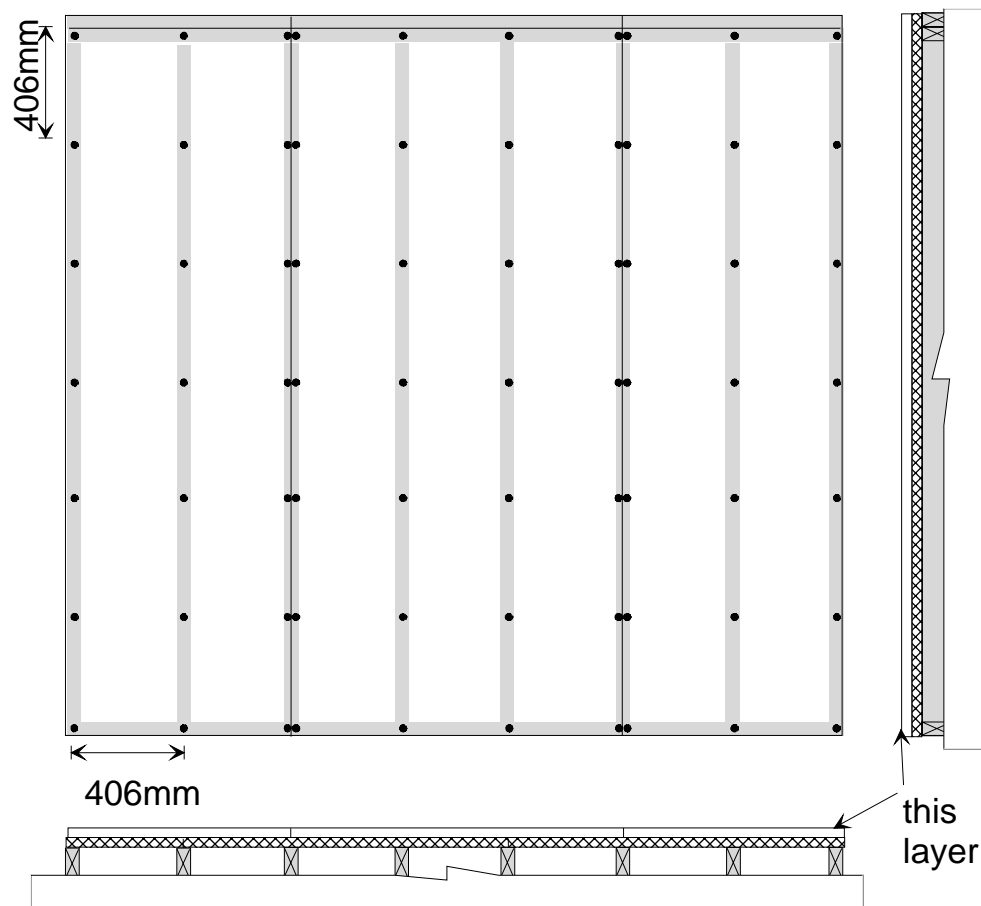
Face-ply of gypsum board oriented vertically and placed over the wood shear resistant panel, wood studs at 406 mm o.c., double plate at top, single plate at bottom. Meets requirements of CAN/CSA-A82.31-M91, Clause 7.3.4. Drawing not to scale.
